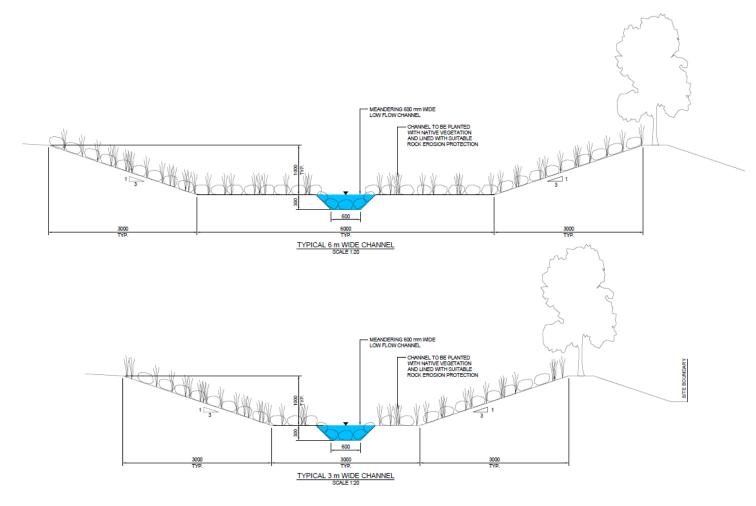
Cross-section of proposed overland flow channel (indicative and subject to detailed design)
